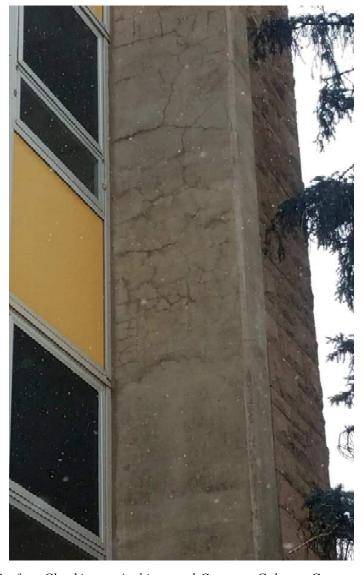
Surface Checking at Architectural Concrete Column, Crane and Hill Halls
